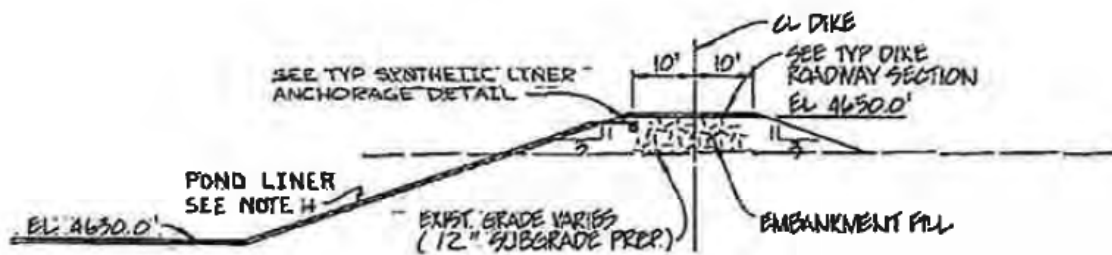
Existing Typical Wastewater Basin Cross-Section
